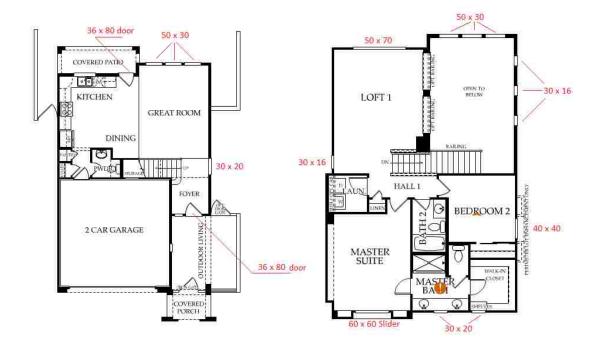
FLOOR PLAN FOR ROMA HOUSE FROM VILLA TRIESTE
